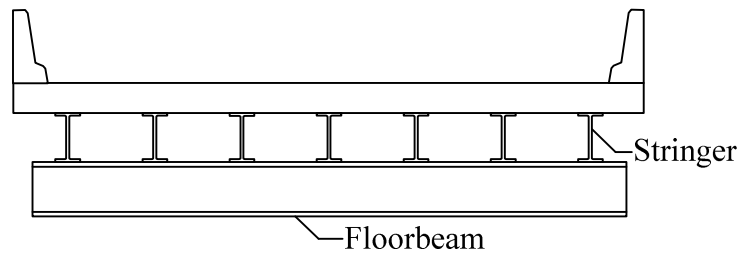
STEEL FLOORBEAM-STRINGER SYSTEM
